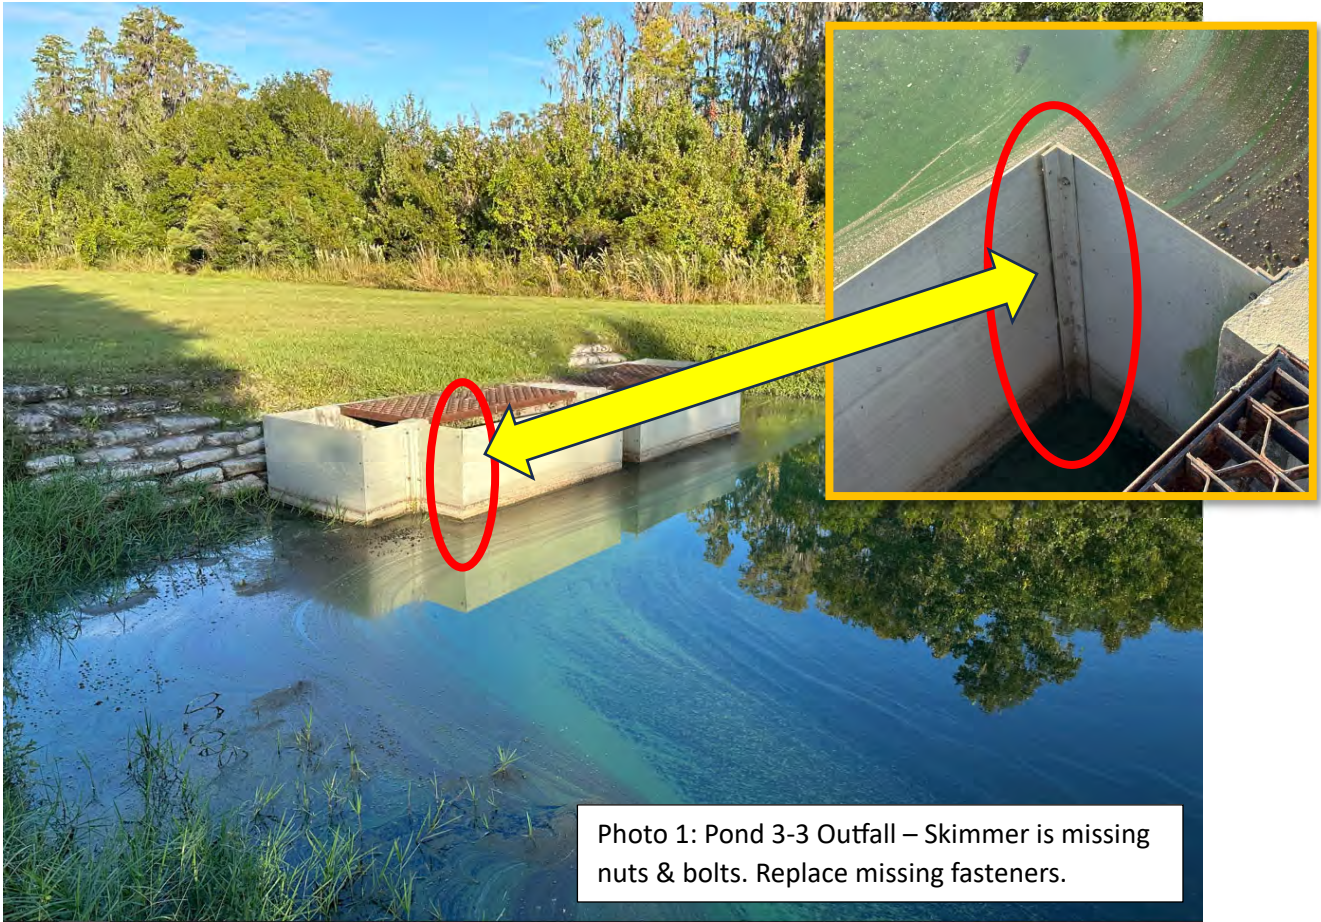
Pond 3-3 Outfall – Skimmer is missing nuts & bolts. Replace missing fasteners.
